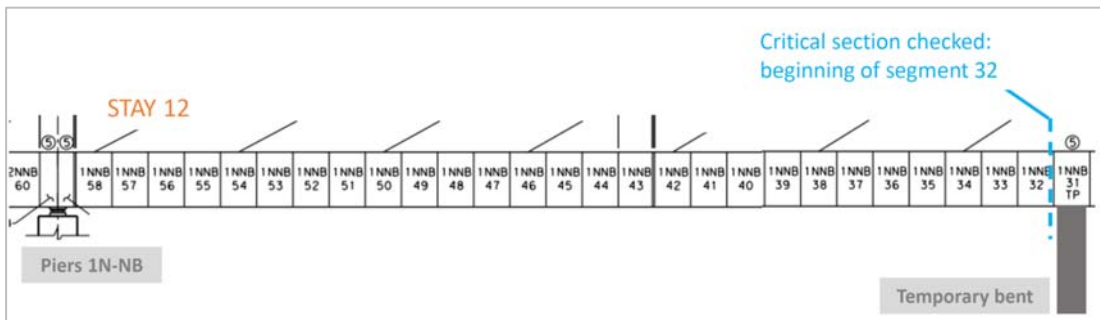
Elevation View Showing Critical Section Investigated (NB shown – SB similar)
